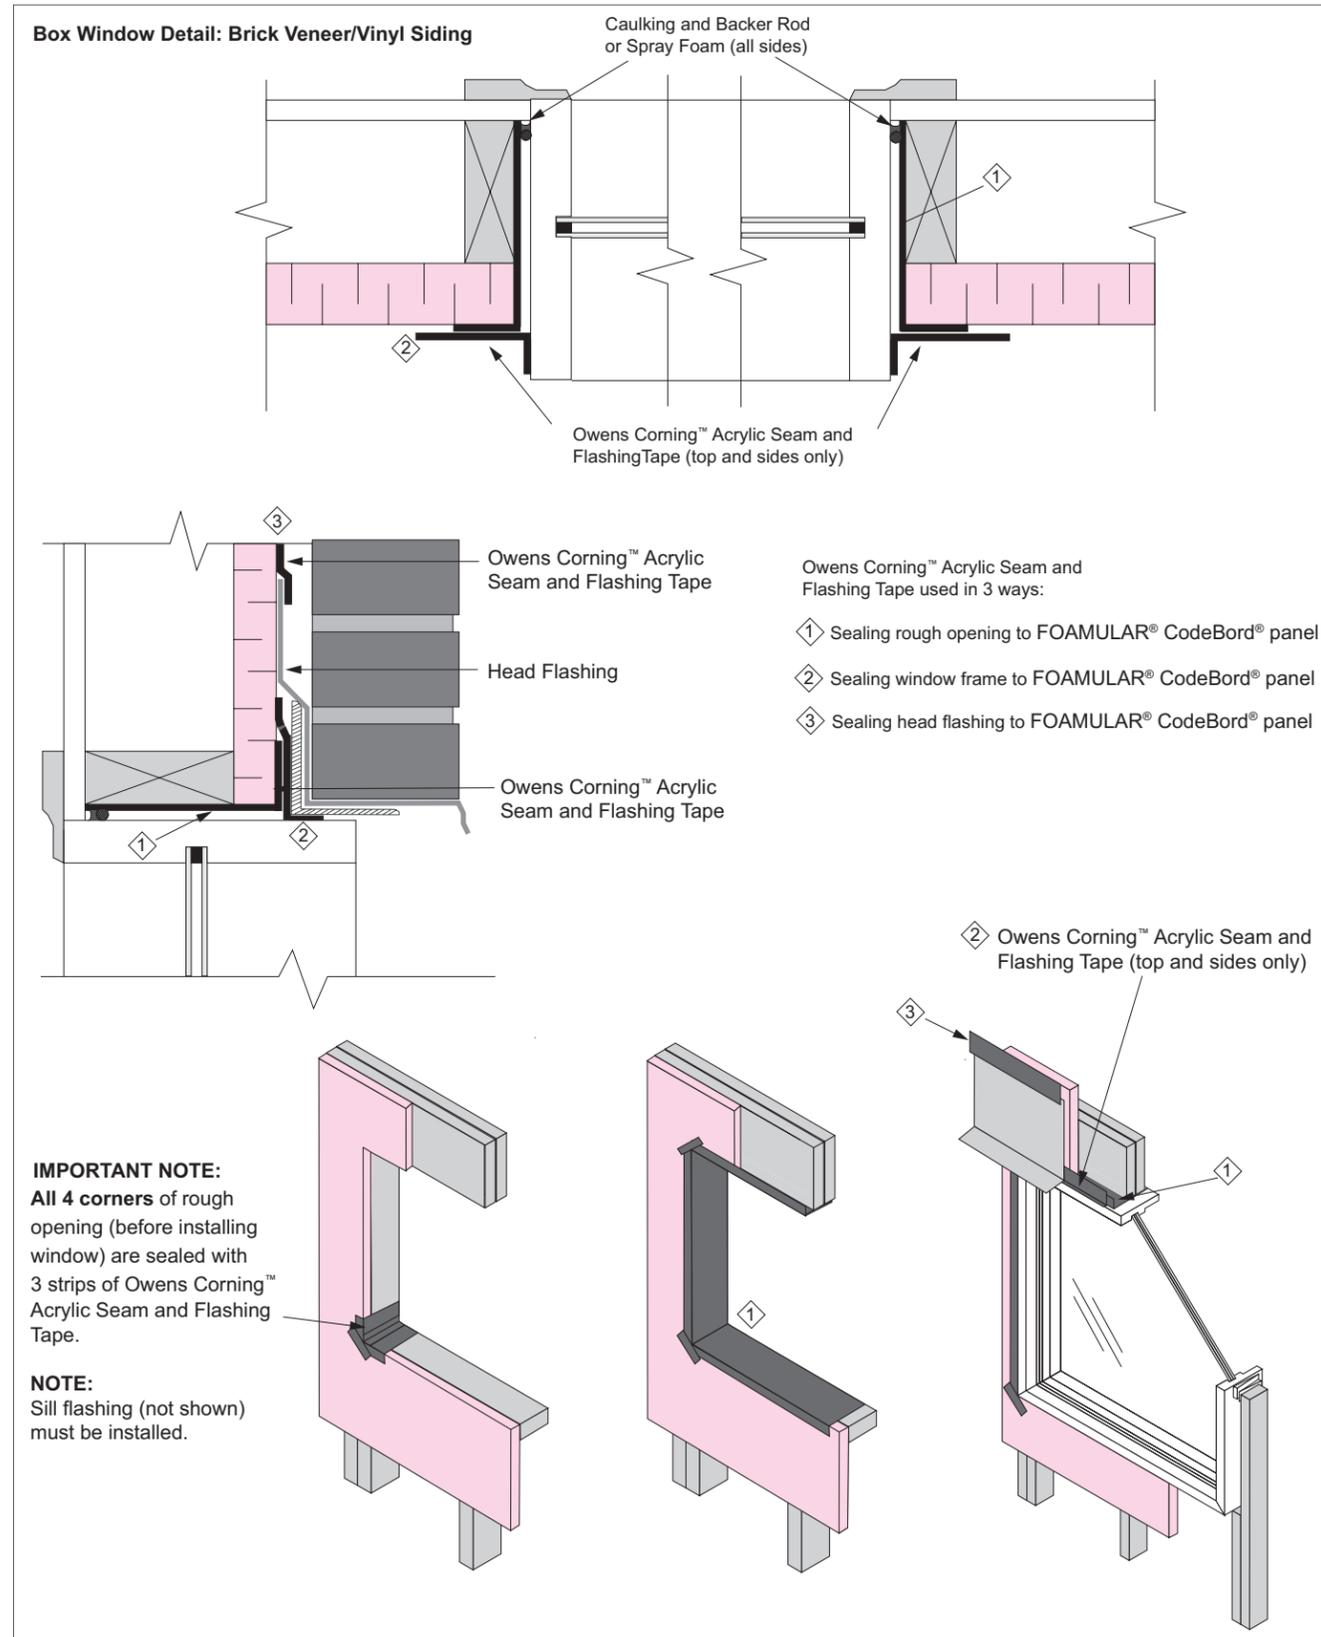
Flashing Around Windows - Owens Corning™ Acrylic Seam and Flashing Tape with No FoamSealR™ Gaskets
